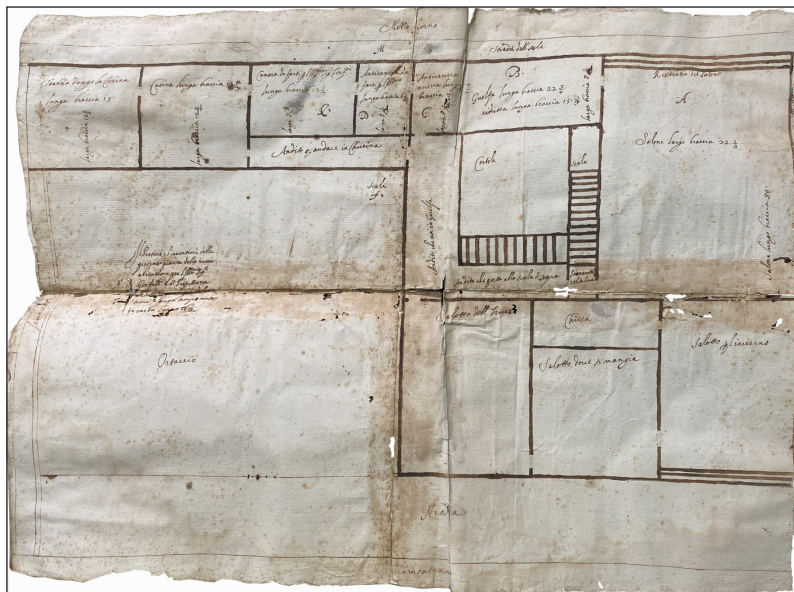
Pier Maria Rutati, plan for the *gonfaloniere*'s new apartment, 1641 (Raccolte 4). Courtesy of Ministero della cultura, Archivio di Stato di Pistoia, prot. n. 1329–2024.
